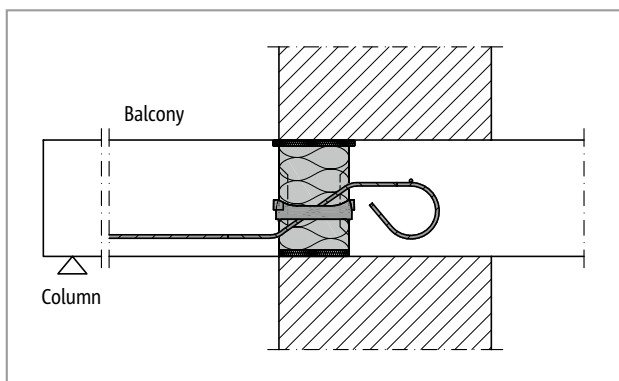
Schöck Isokorb® XT type Q: Connection with single wall, thermally insulating masonry (XT type Q-V1 to V4)
